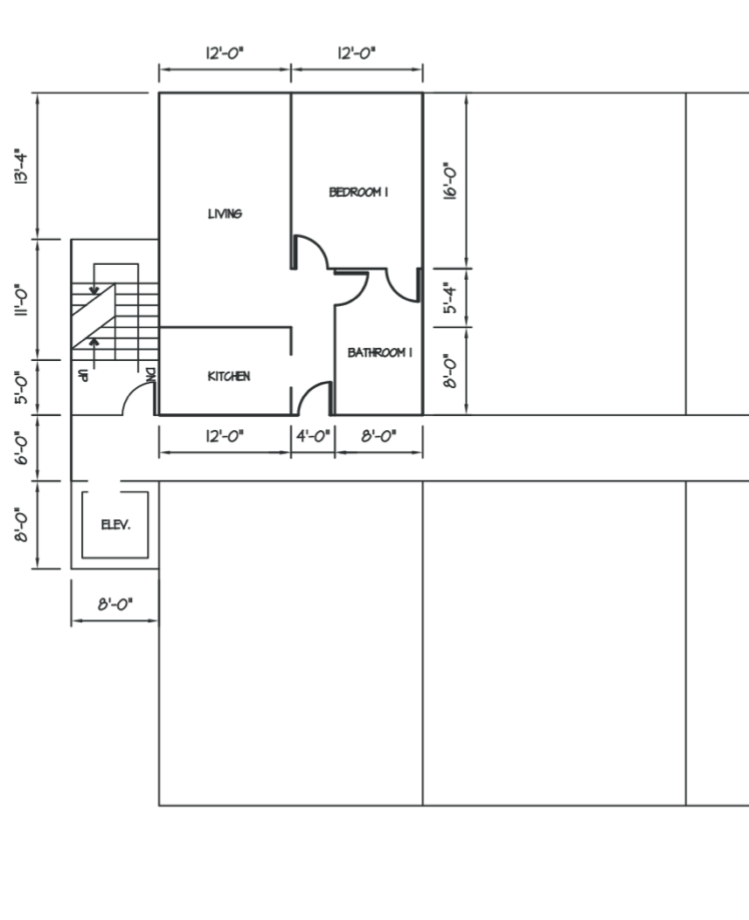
NIST Floor Plan of APT-26 (Case 11)
